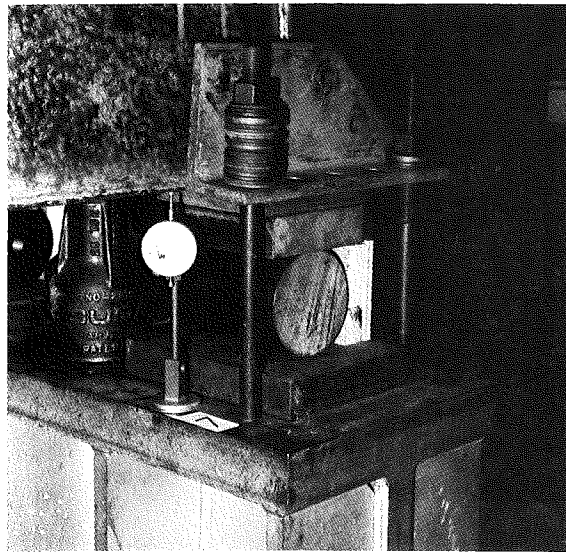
X-Y Roller Bearing and Bracing at Specimen End
